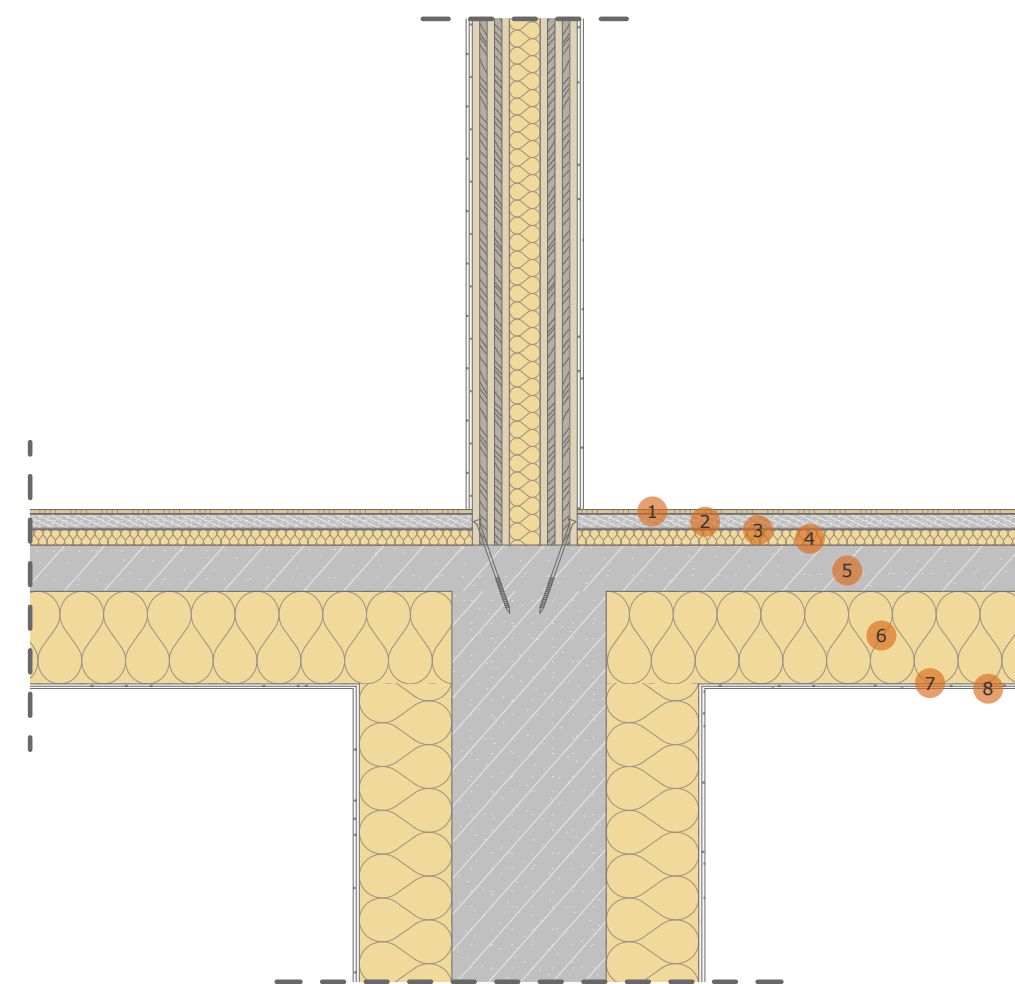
DETAIL EXTERIOR WALL/BUILDING ENVELOPE
